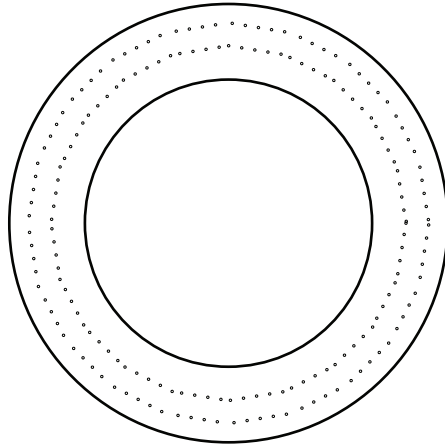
Distribution of reinforcement (Illustration only, not measurable)
